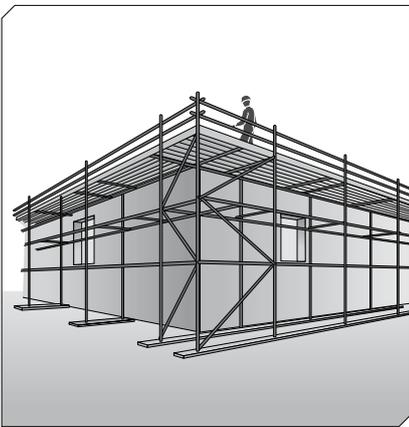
Perimeter scaffold with a fully decked working platform, guardrails and toeboards.
